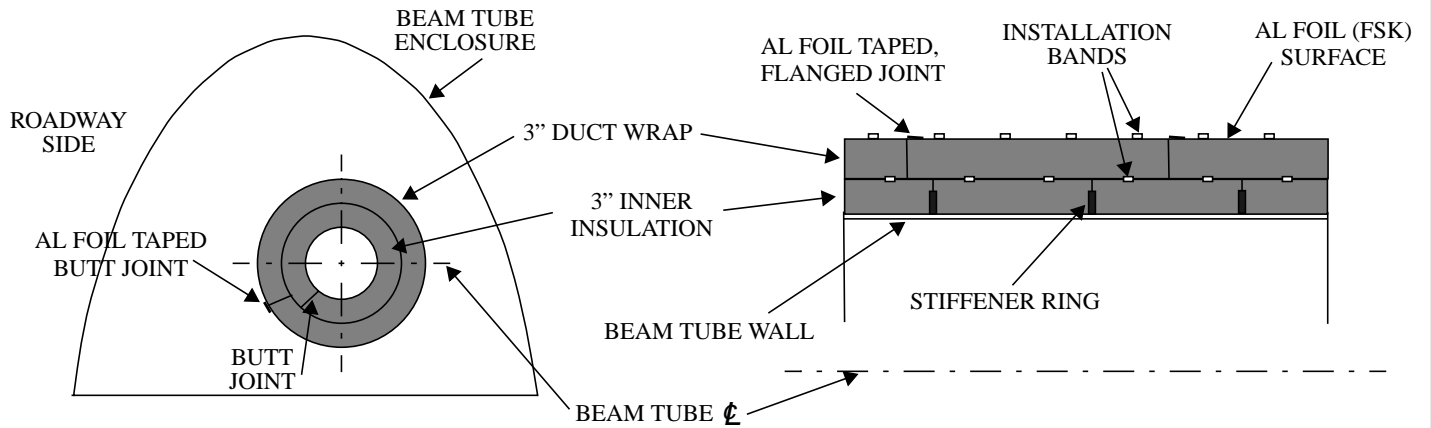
Beam tube wall insulation - schematic (not to scale) section views
